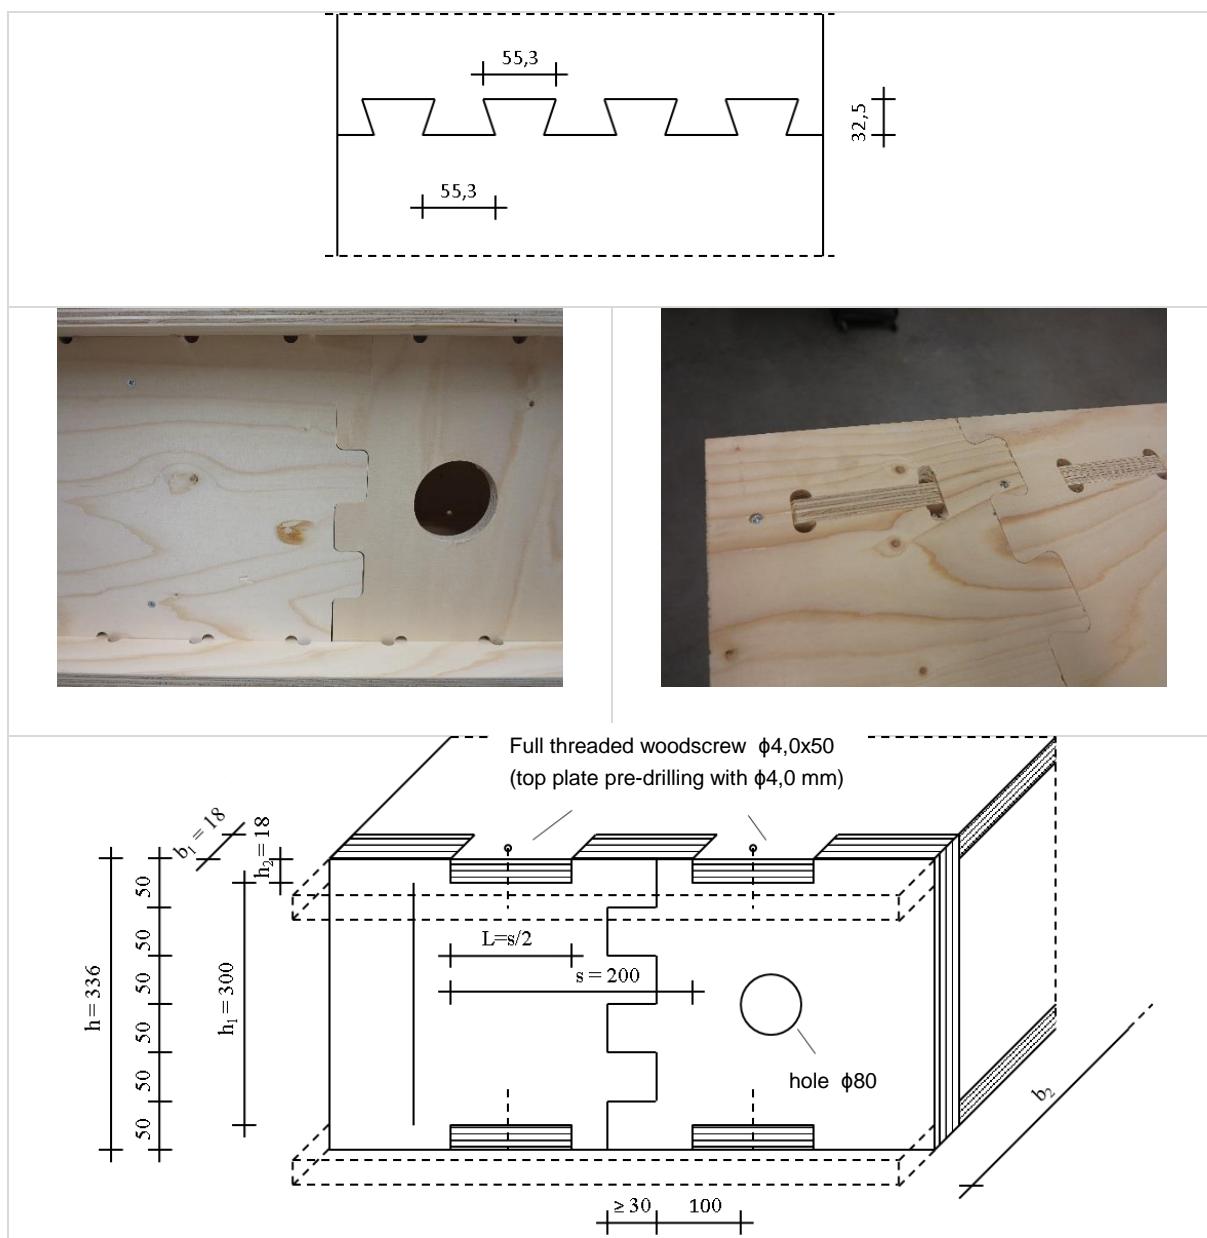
Details of the joints: cover plates (left) and webs (right).
